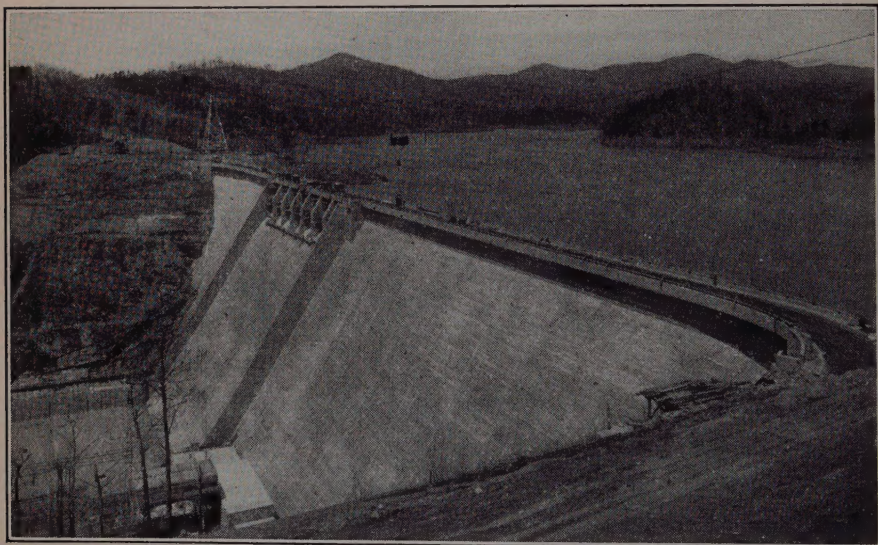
GENERAL VIEW, HIWASSEE DAM, LOOKING UPSTREAM FROM THE SOUTHWEST
